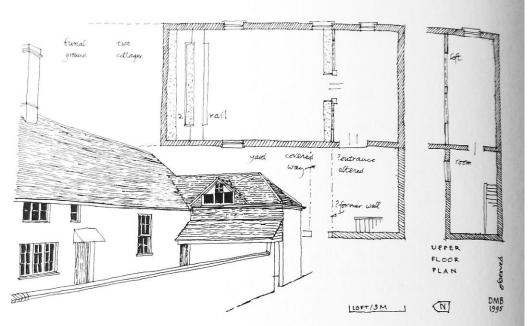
Perspective, ground and first floor plan (Butler (1999), vol. 1, p. 228) (North is to the left, not to scale)
